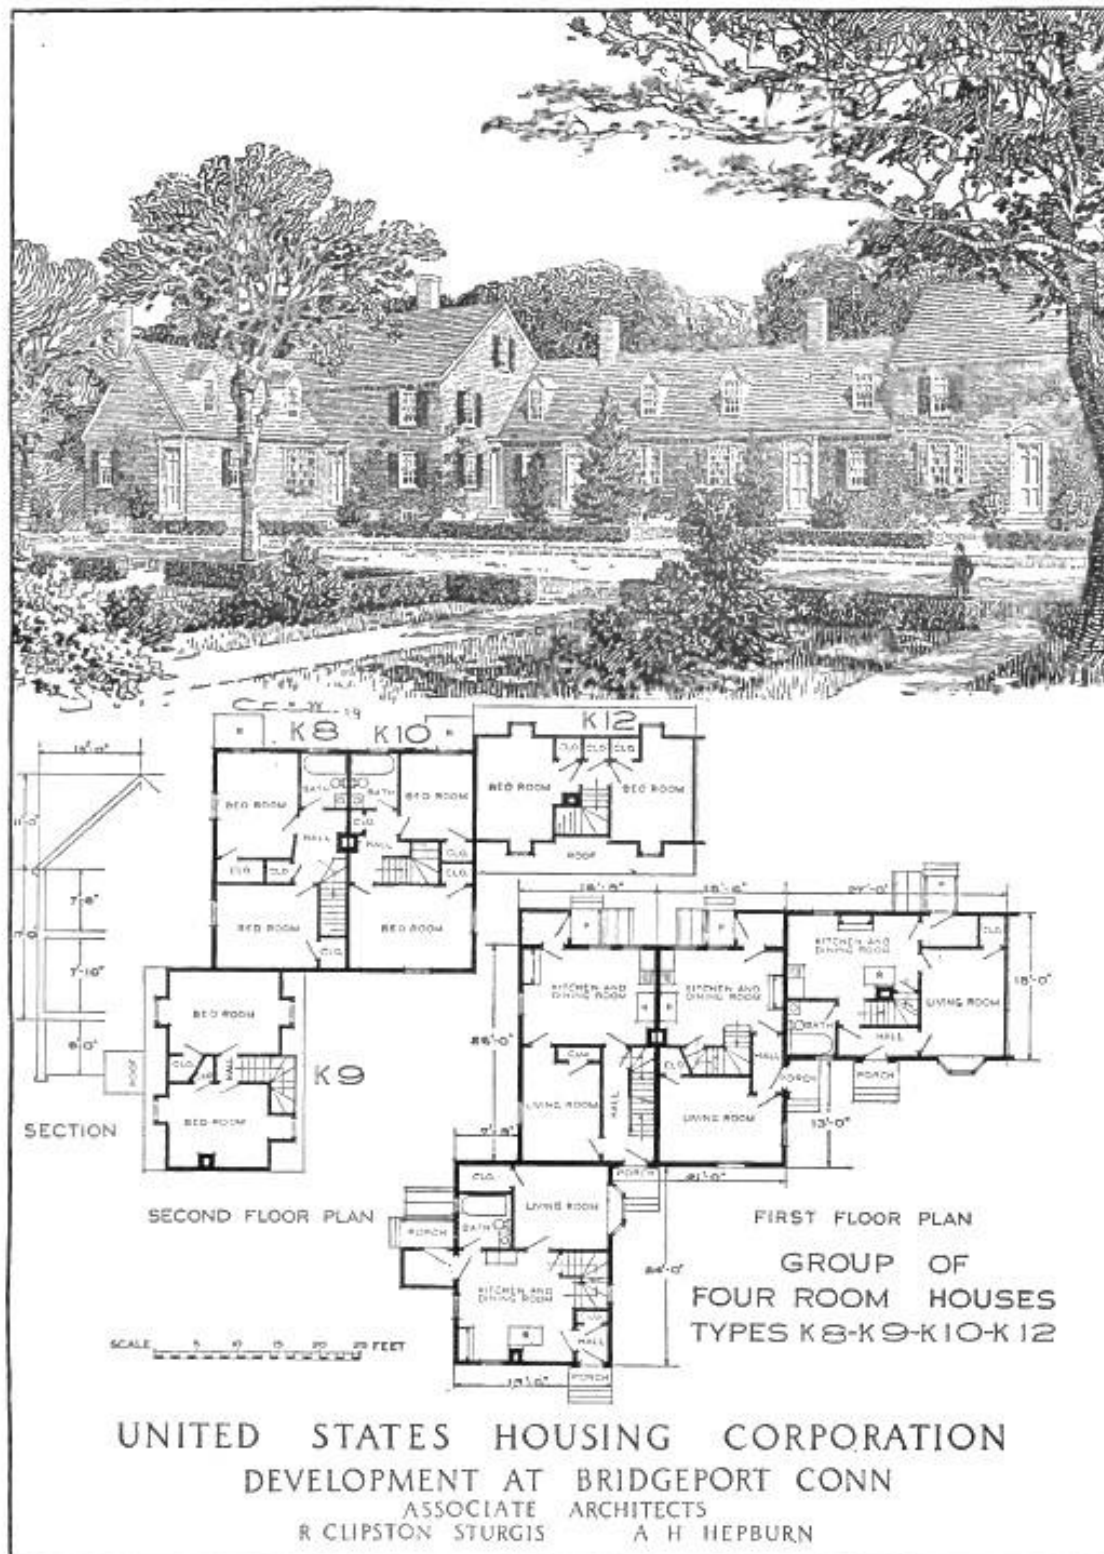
Floor Plans K8, K9, K10, K11 & K12
